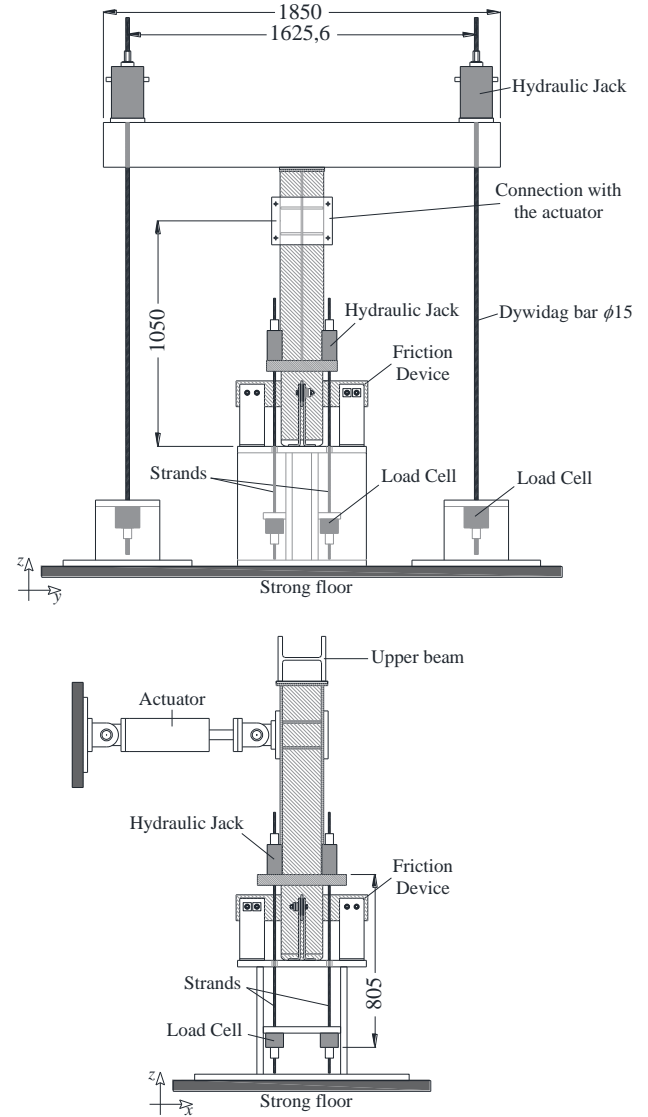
Front and lateral view of the column base's test setup (dimensions in mm)
